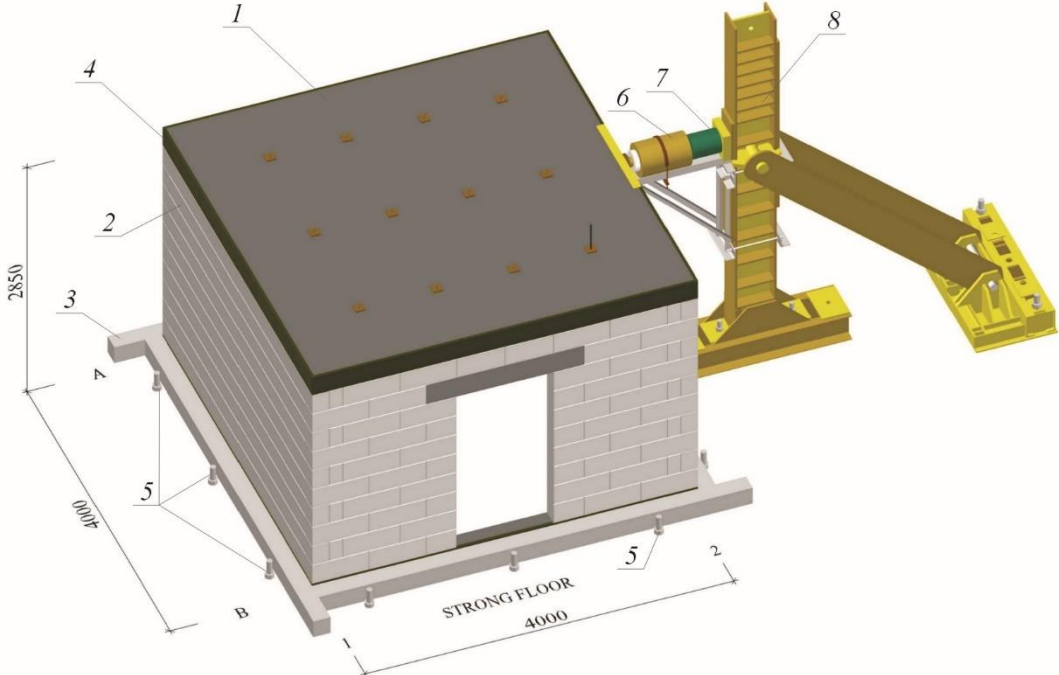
Research model in the test stand: 1 – slab, 2 – masonry wall made of autoclaved aerated concrete units, 3 – bottom beam, 4 – top beam, 5 – fixing the building model in the slab of great forces, 6 – hydraulic actuator, 7 – force gauge, 8 – steel column
